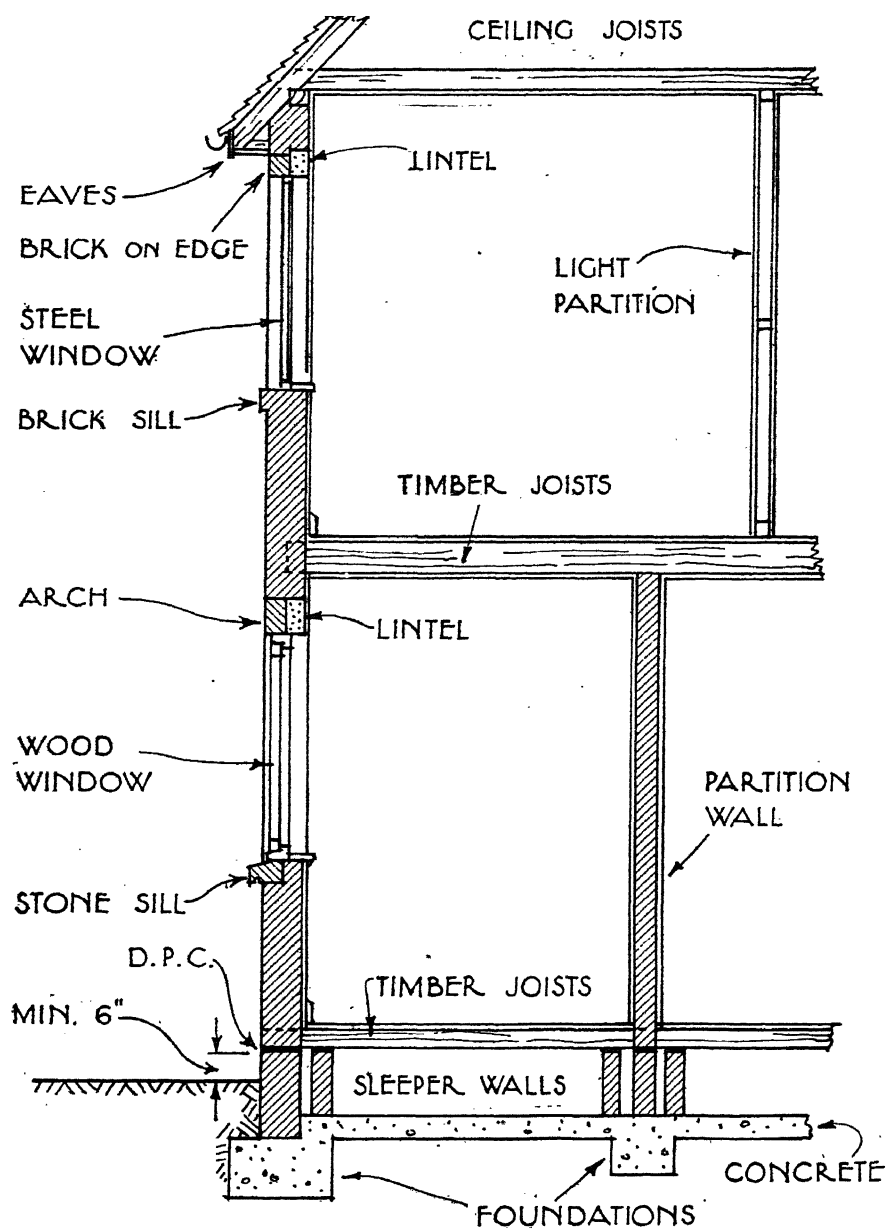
CROSS SECTION THROUGH BUILDING WITH LOAD-BEARING WALLS
